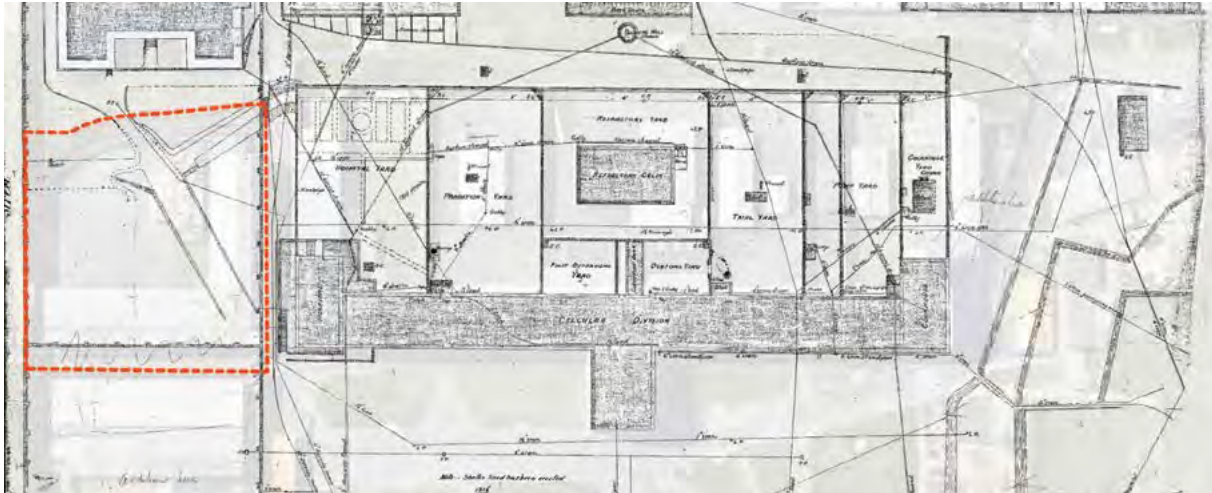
The c.1896 plan shows the first indication of activity in the New Division management zone. At this time the zone appears to provide the main access route to the Hospital. The walls dividing the Hospital and New Division from the Women's quarter and the Main Cell Block are visible in the plan.
